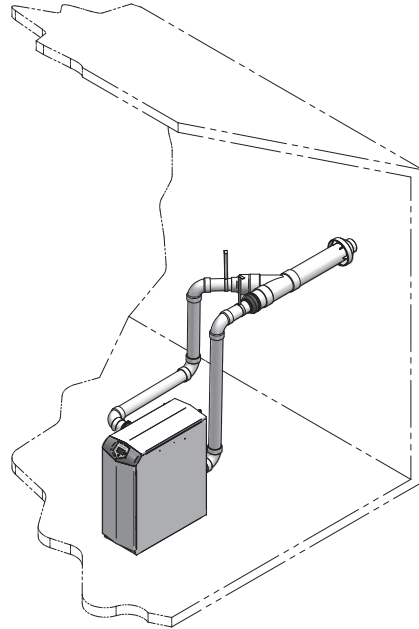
PVC/CPVC Concentric Sidewall Termination (Models 151 - 601 Only) - See page 31 for more details
